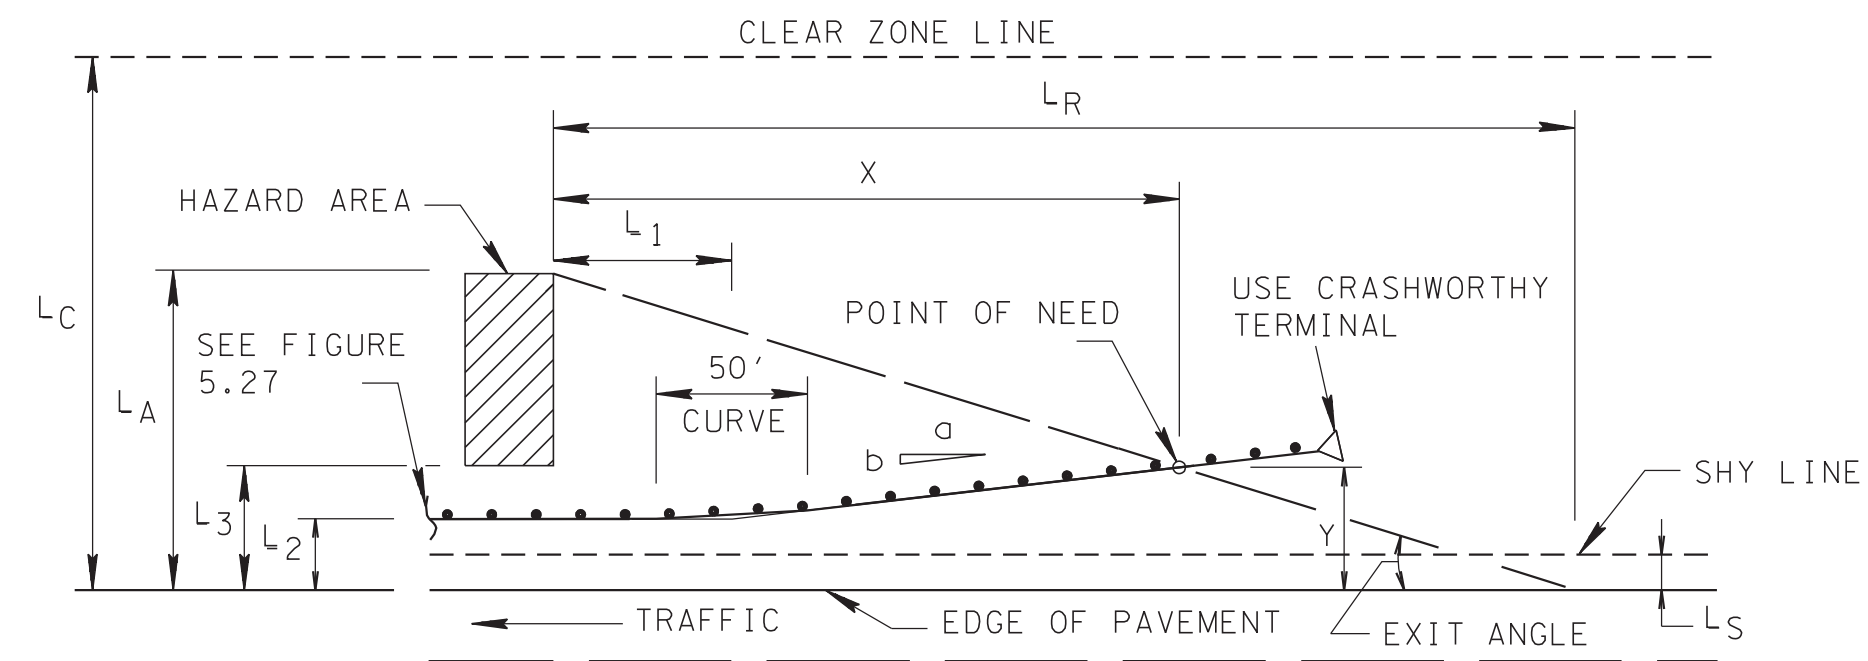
APPROACH BARRIER LAYOUT VARIABLES
